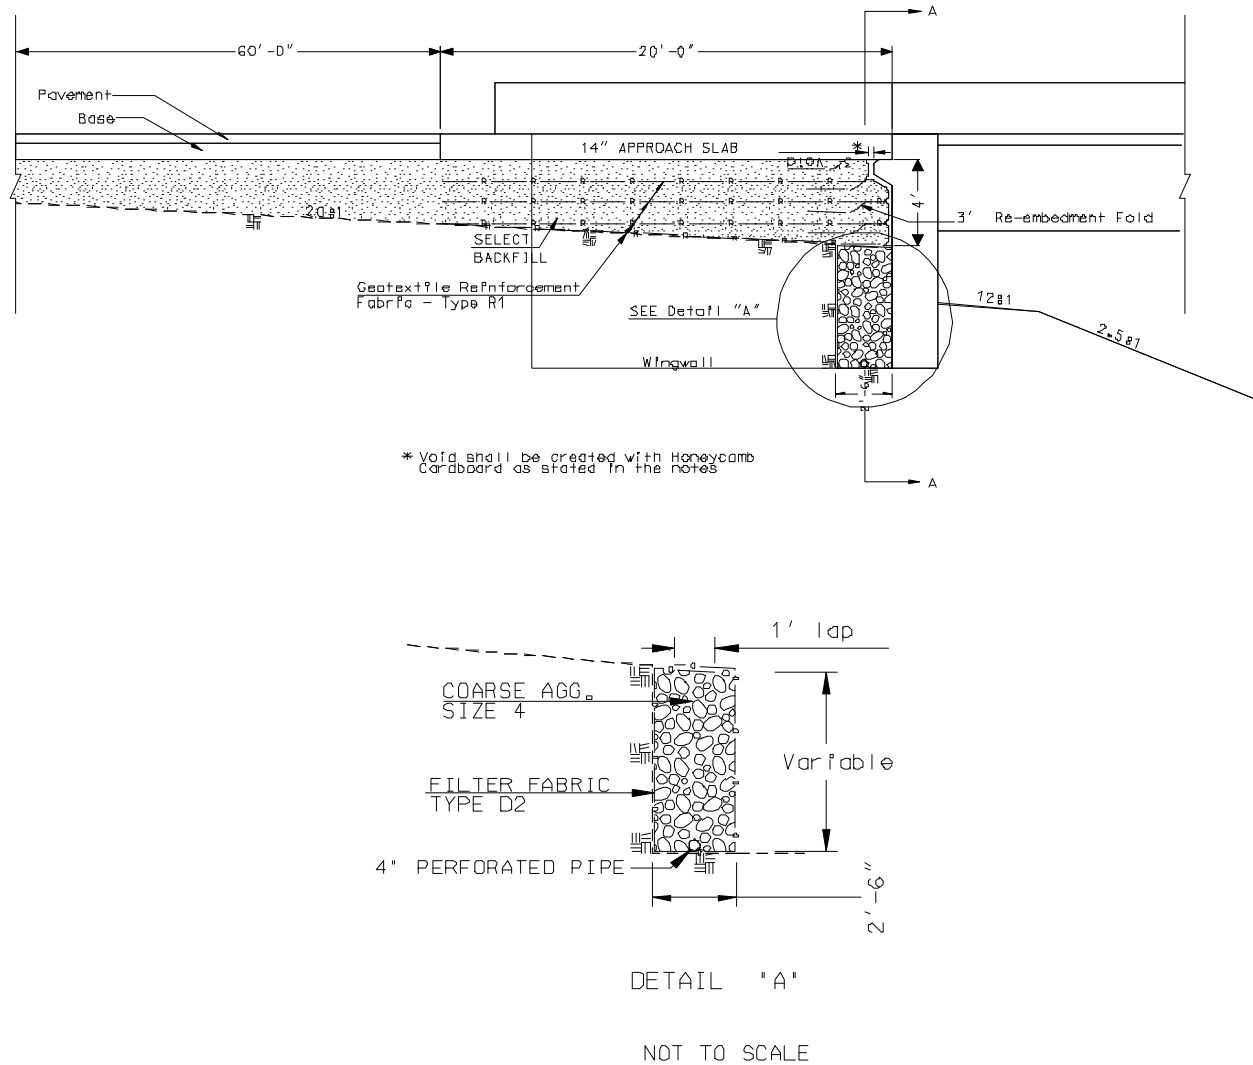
Detail for Fabric Reinforced Backfill under the Approach Slab
